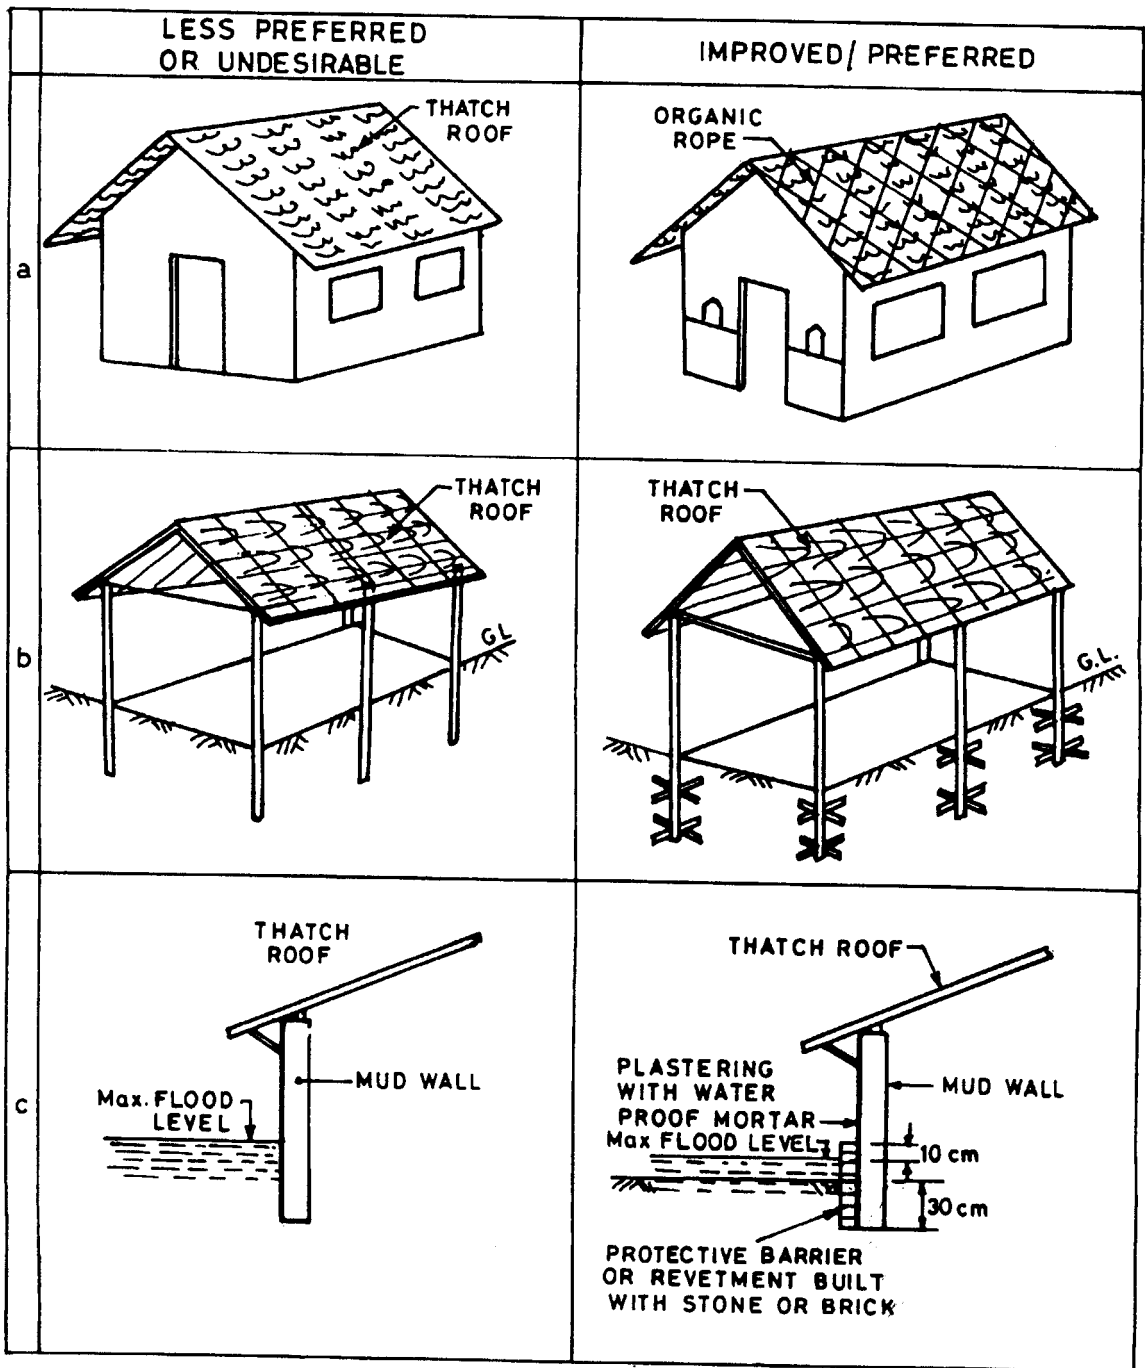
IMPROVEMENTS FOR THATCHED ROOFS AND MUD WALLS TO REDUCE DAMAGES DUE TO CYCLONES
